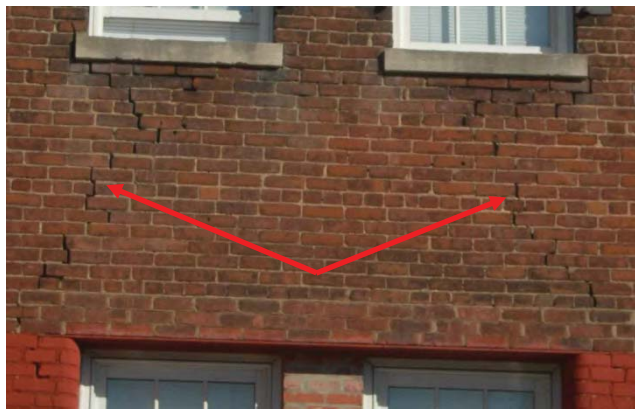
South-SE elevation – Crack repair needed between 1st and 2nd floors
